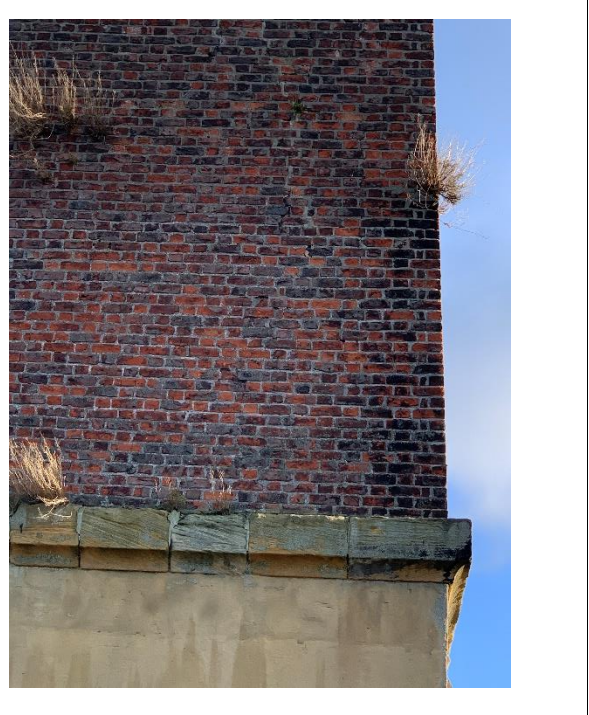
Wall Section 2, No bond between infill panel and pier.
